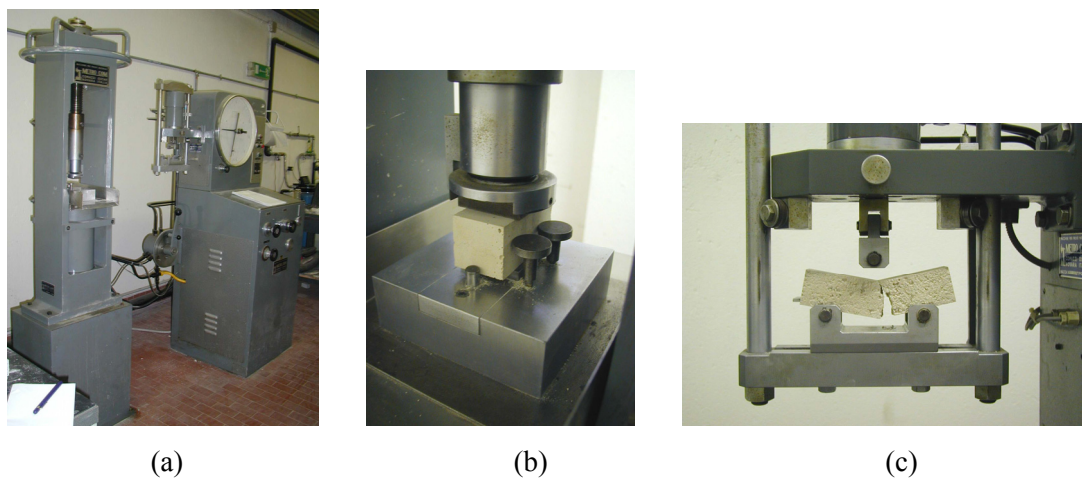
Test setup for the compressive and flexural tests on mortar specimens: (a) testing machine, (b) detail of the compressive test setup and (c) detail of the flexural test setup.
